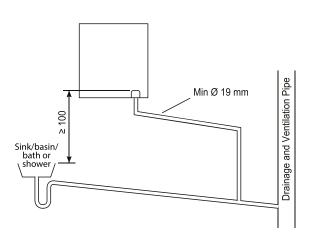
Connection of Condensate Water Drainage Pipe at Indoor Bathroom Drainage Lower Level
